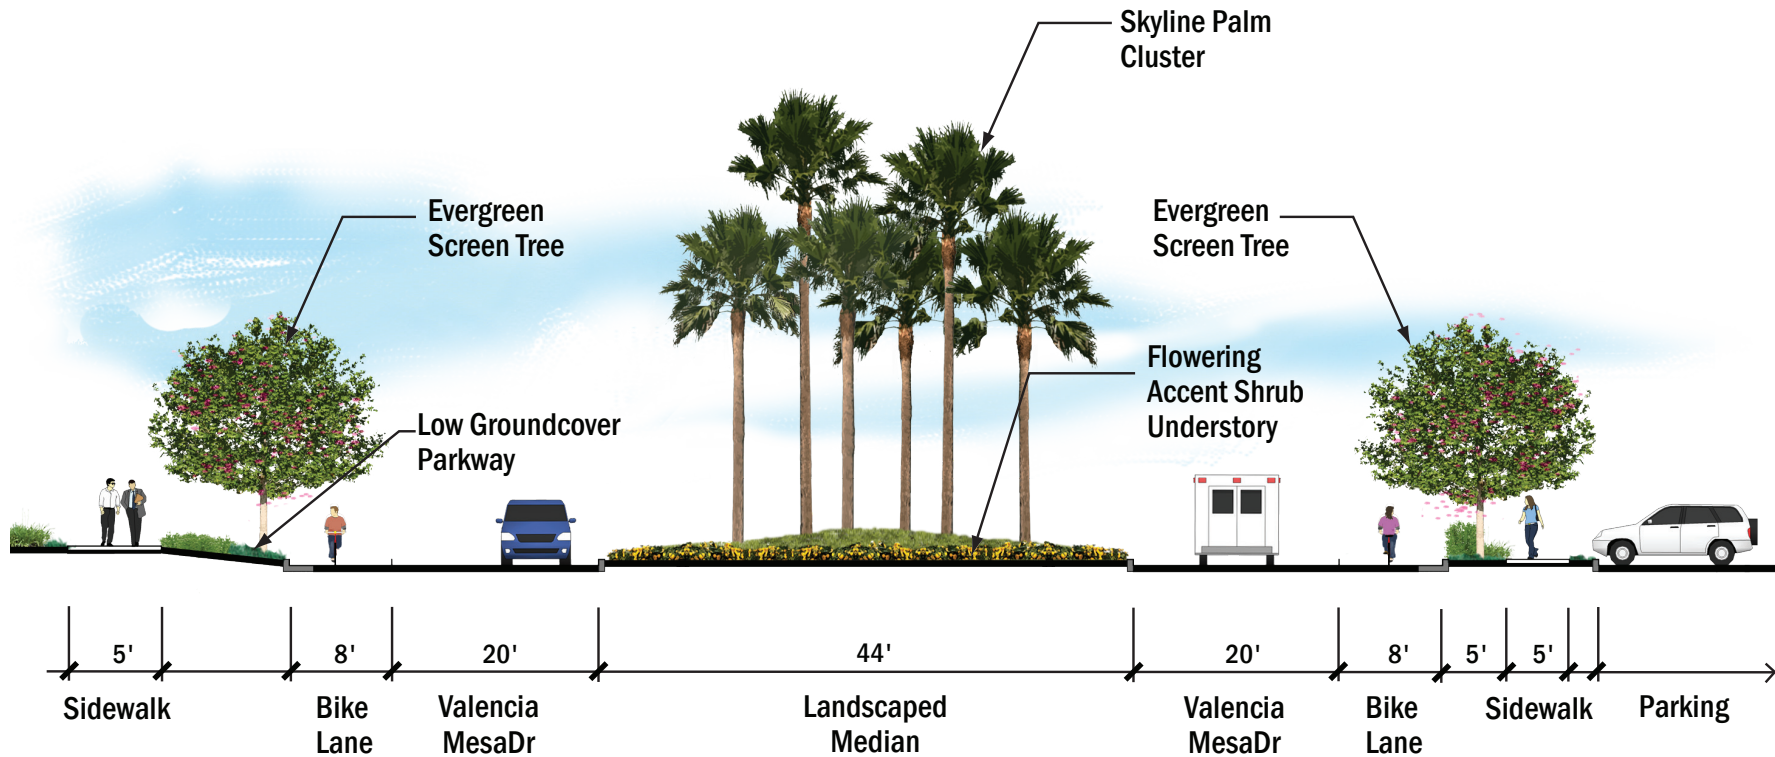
, Streetscape Conceptual - Entry Roundabout at Valencia Mesa Drive
